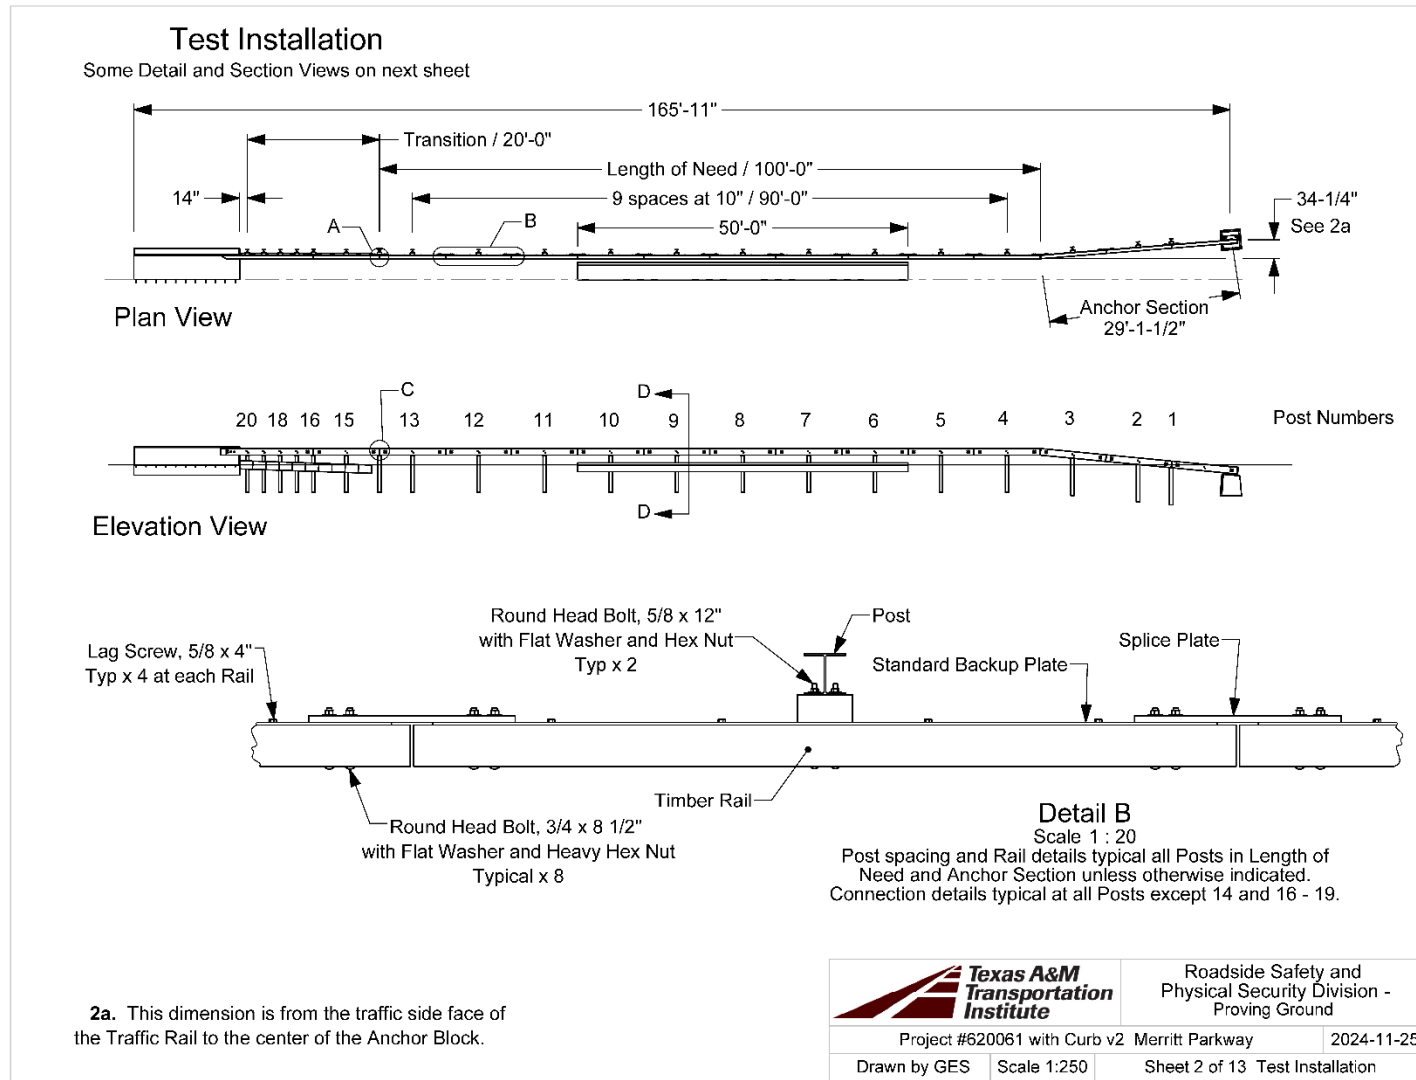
Details of Merritt Parkway Guiderrail for Tests 620061-01-1&amp;3.
